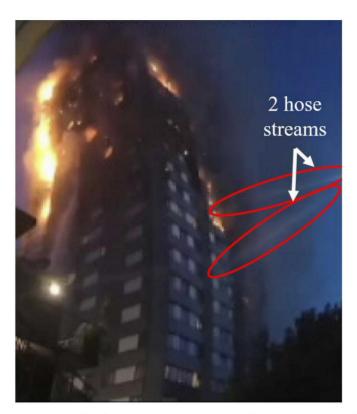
Two firefighting jets on the East elevation of the building at 03:59 (MET00012593)
